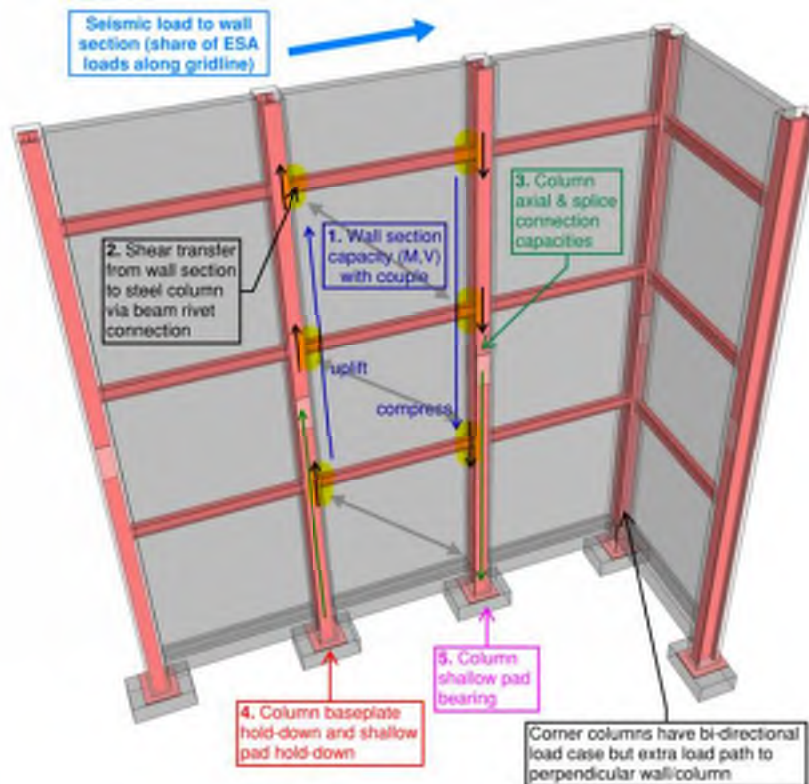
Combined concrete wall / steel column mechanism with load transfer to the foundations.
